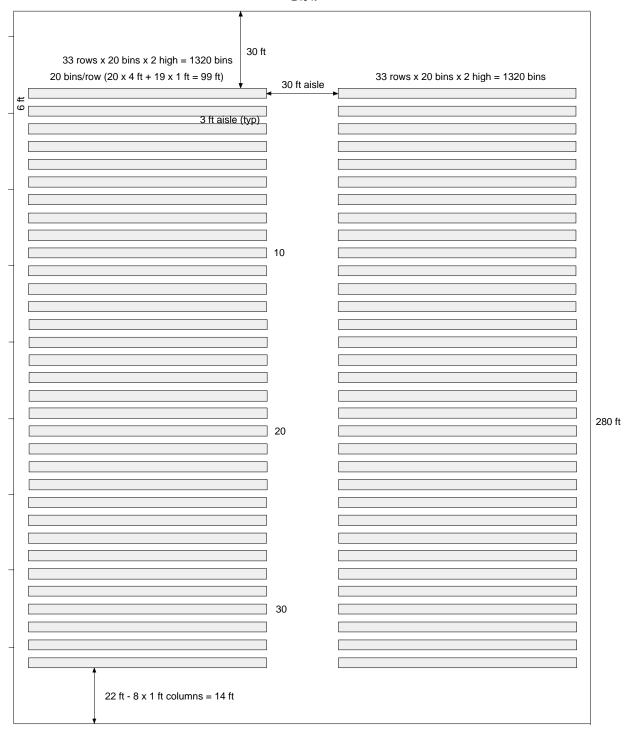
U3O8 Storage Building Plan Conversion to U3O8, AHF and CaF2
